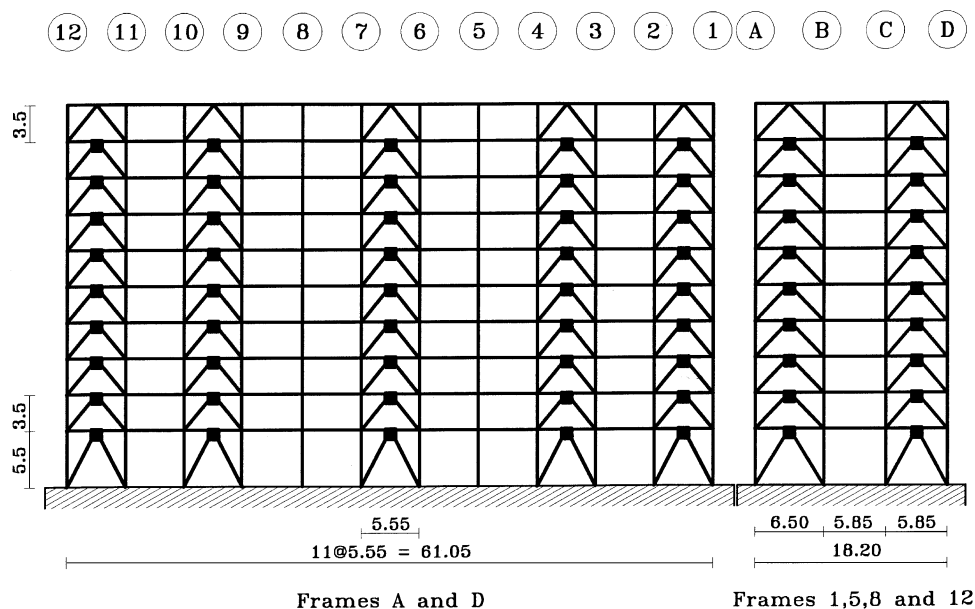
Elevations of the alternate ADAS retrofit (dimensions in meters)
